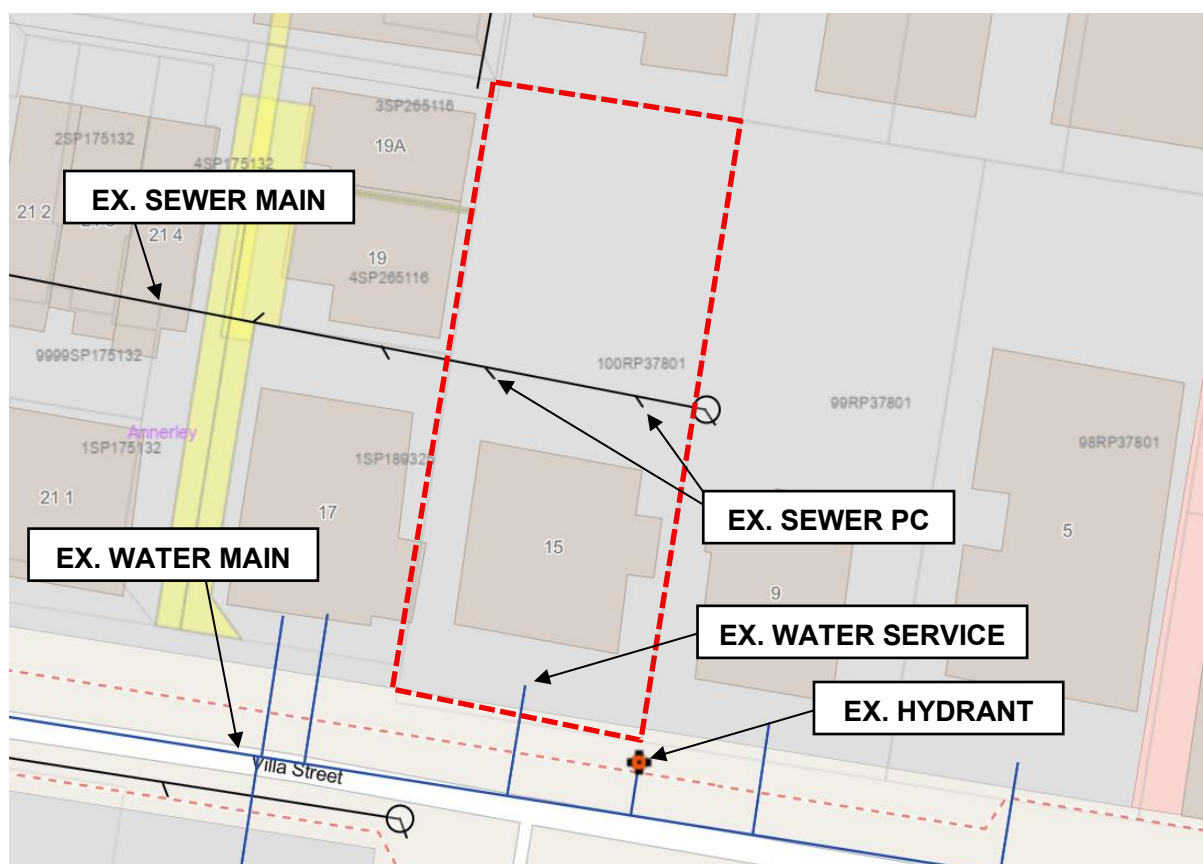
UU GIS sewer and reticulated water infrastructure plan
